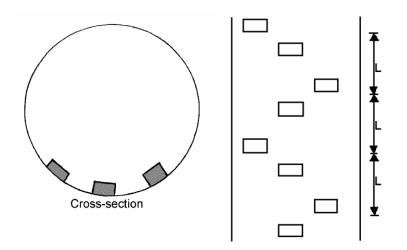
Plan view (right) and cross-section (left) of Alberta fish baffles. Note zig-zag arrangement compared to spoiler baffles (Boubée et al. 1999).
